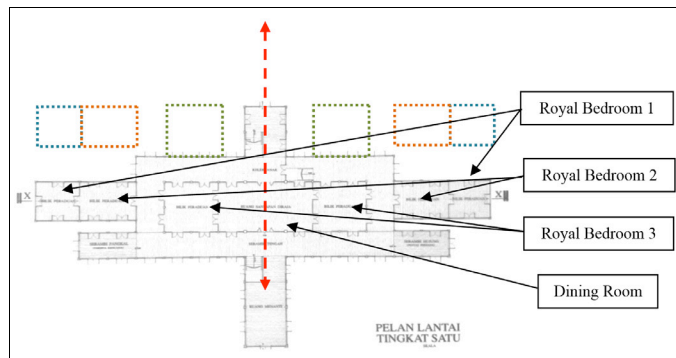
First Floor Plan of Istana Lama Seri Menanti (KALAM, 1993)
